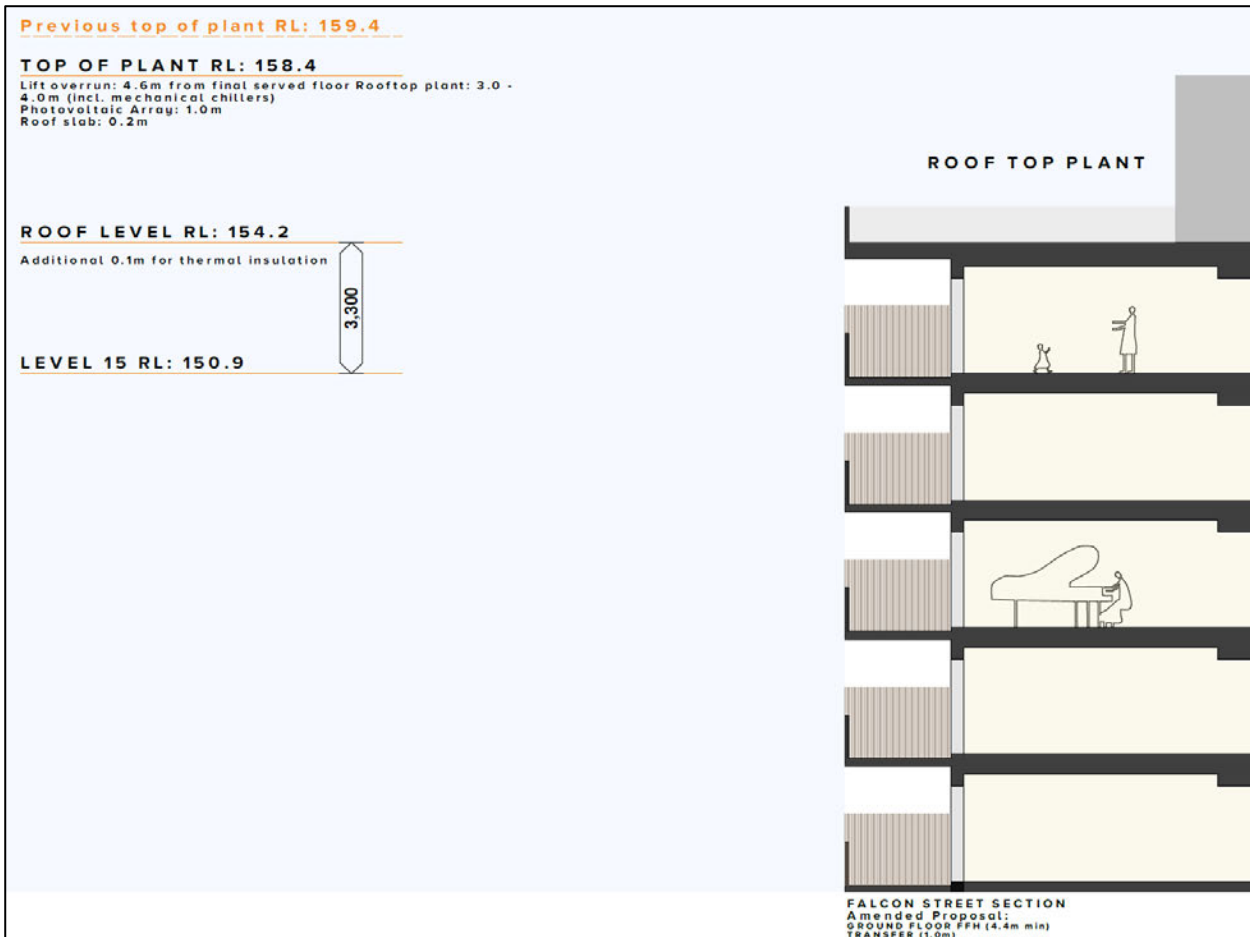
Proposed rooftop plant development section (source: *Urban Design Report, Turner*)
